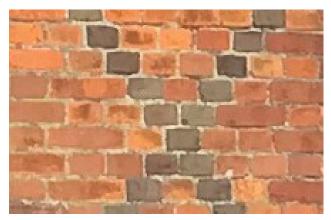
Red brick with with blue diaper work detail of the Village Hall facade
